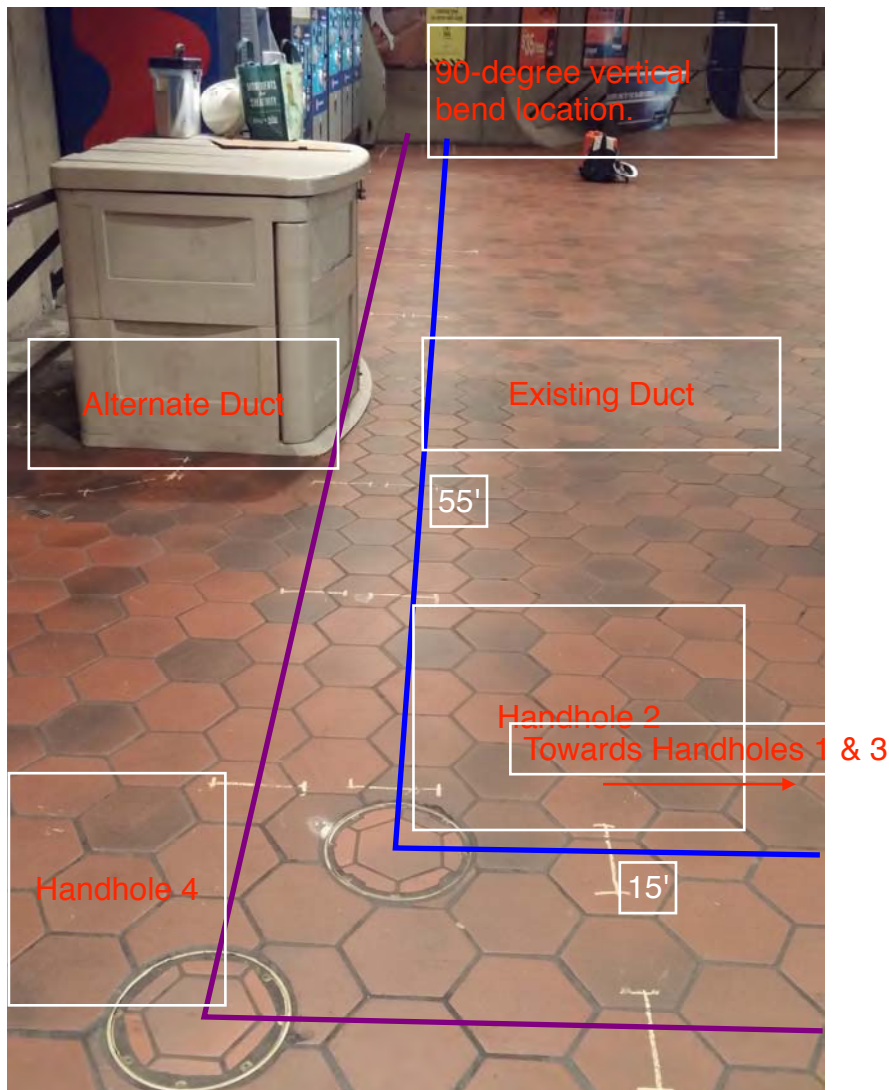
Existing / Alternate Ducts on mezzanine floor.
